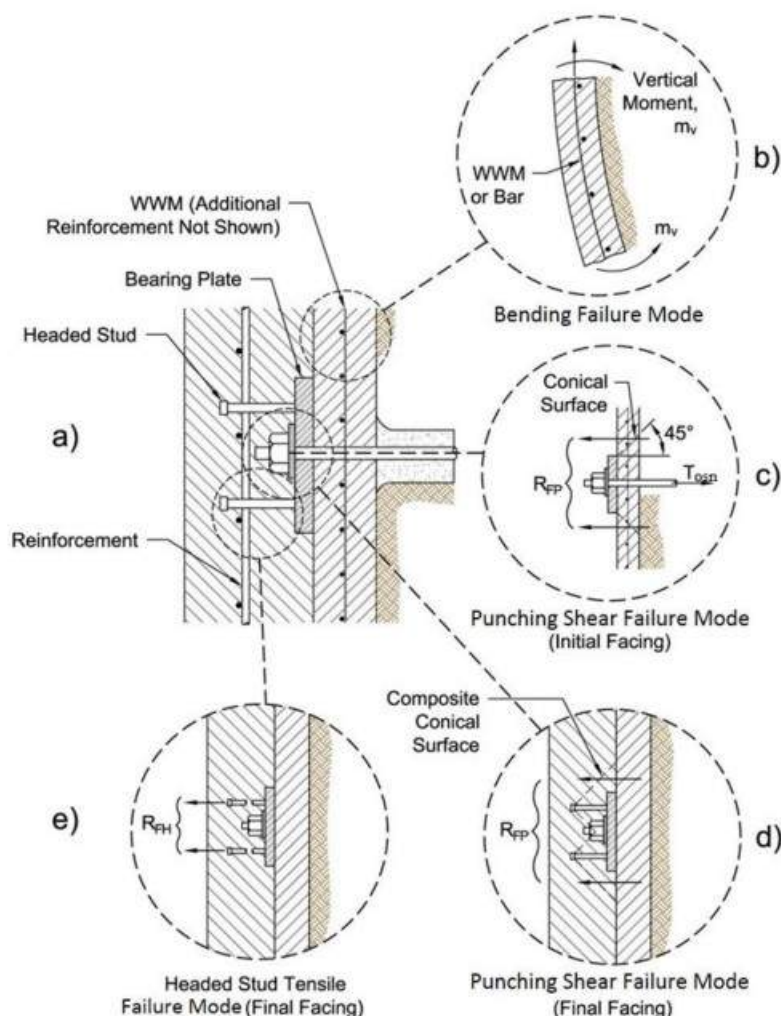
Failure Modes to be Considered in Soil Nail Wall Facings: (a) Typical Section, (b) Flexure for Both Initial and Final Facing; (c) Punching Shear in Initial Facing; (d) Punching Shear in Final Facing; and (e) Headed stud in Tension
